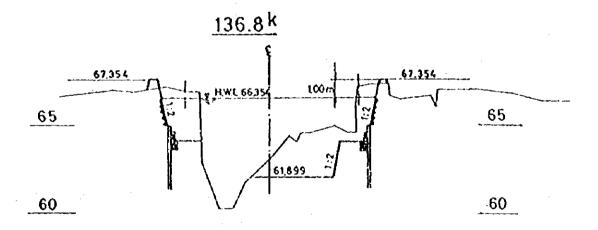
(1) TYPICAL DESIGN CROSS SECTION
